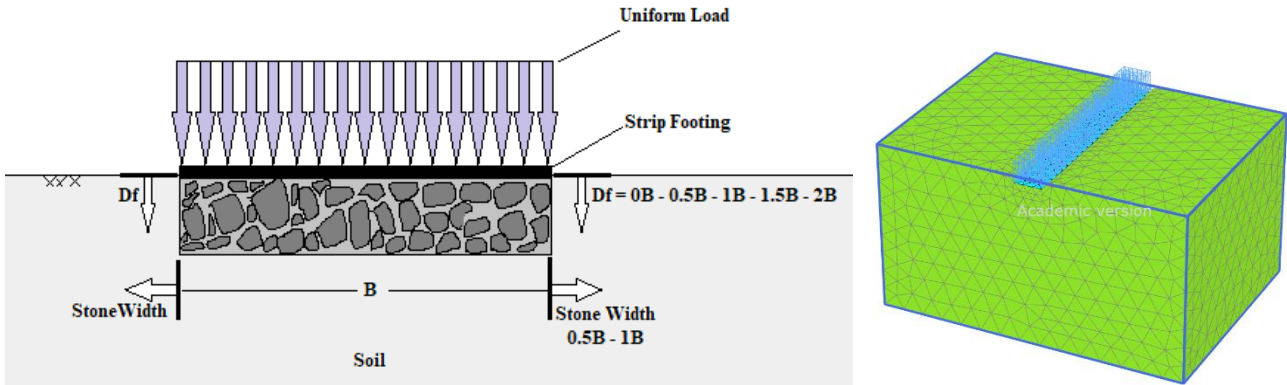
Schematic Shape of Foundation and Stone Blockage Modelling
